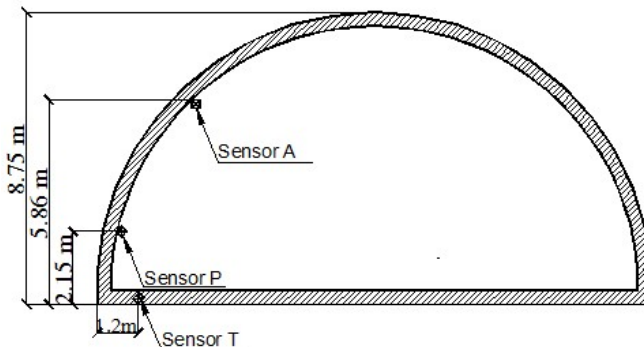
Location of sensors in the existing tunnel at Croix-Rousse tunnel
